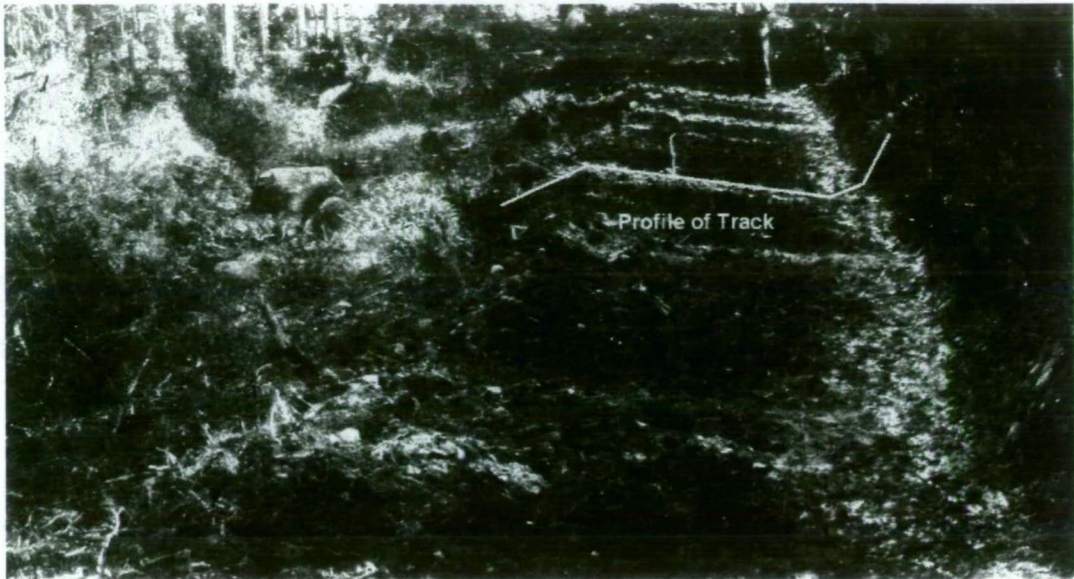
Detail of Track as Constructed in Area of Benched Sites, Viewed from East (Spurling 1898)
